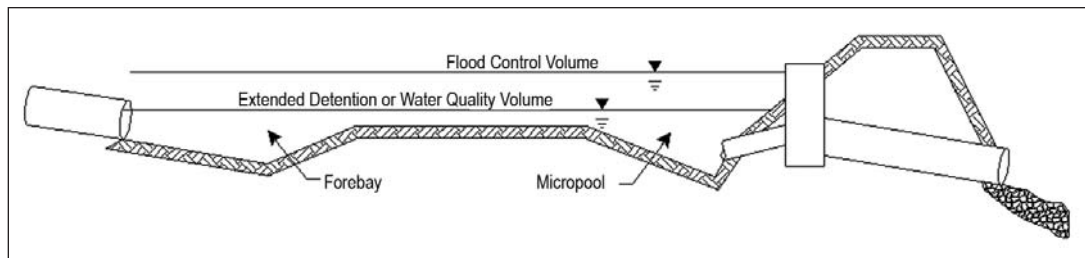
Storm Water Pond with Extended Detention and Flood Control Volumes
